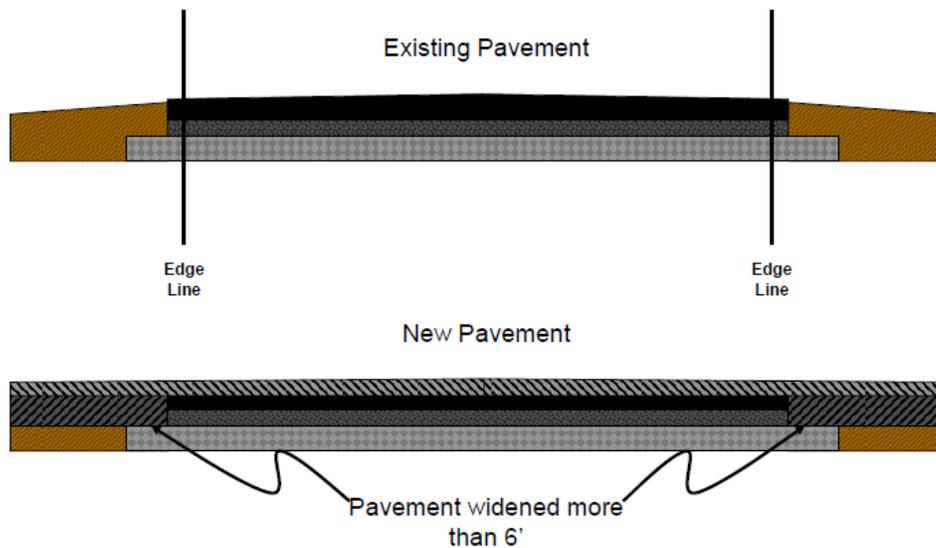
Type 3 trench widening to increase lane width (“Pavement and Trench Widening Workshop,” VDOT)
